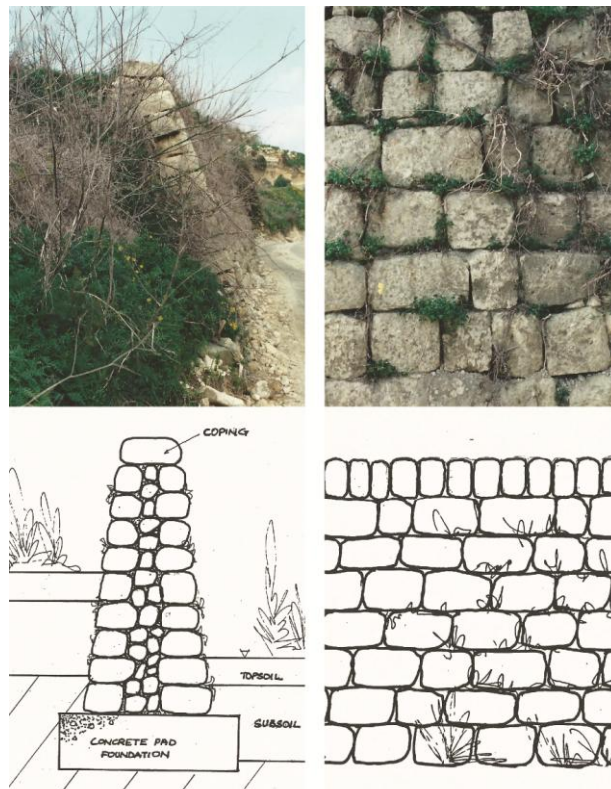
Section (top left) and elevation (top, right) of a typical rubble wall along the valley bed of Wied il-Mielah. These were used to prepare the respective section (bottom, left) and elevation (bottom, right) respectively.
